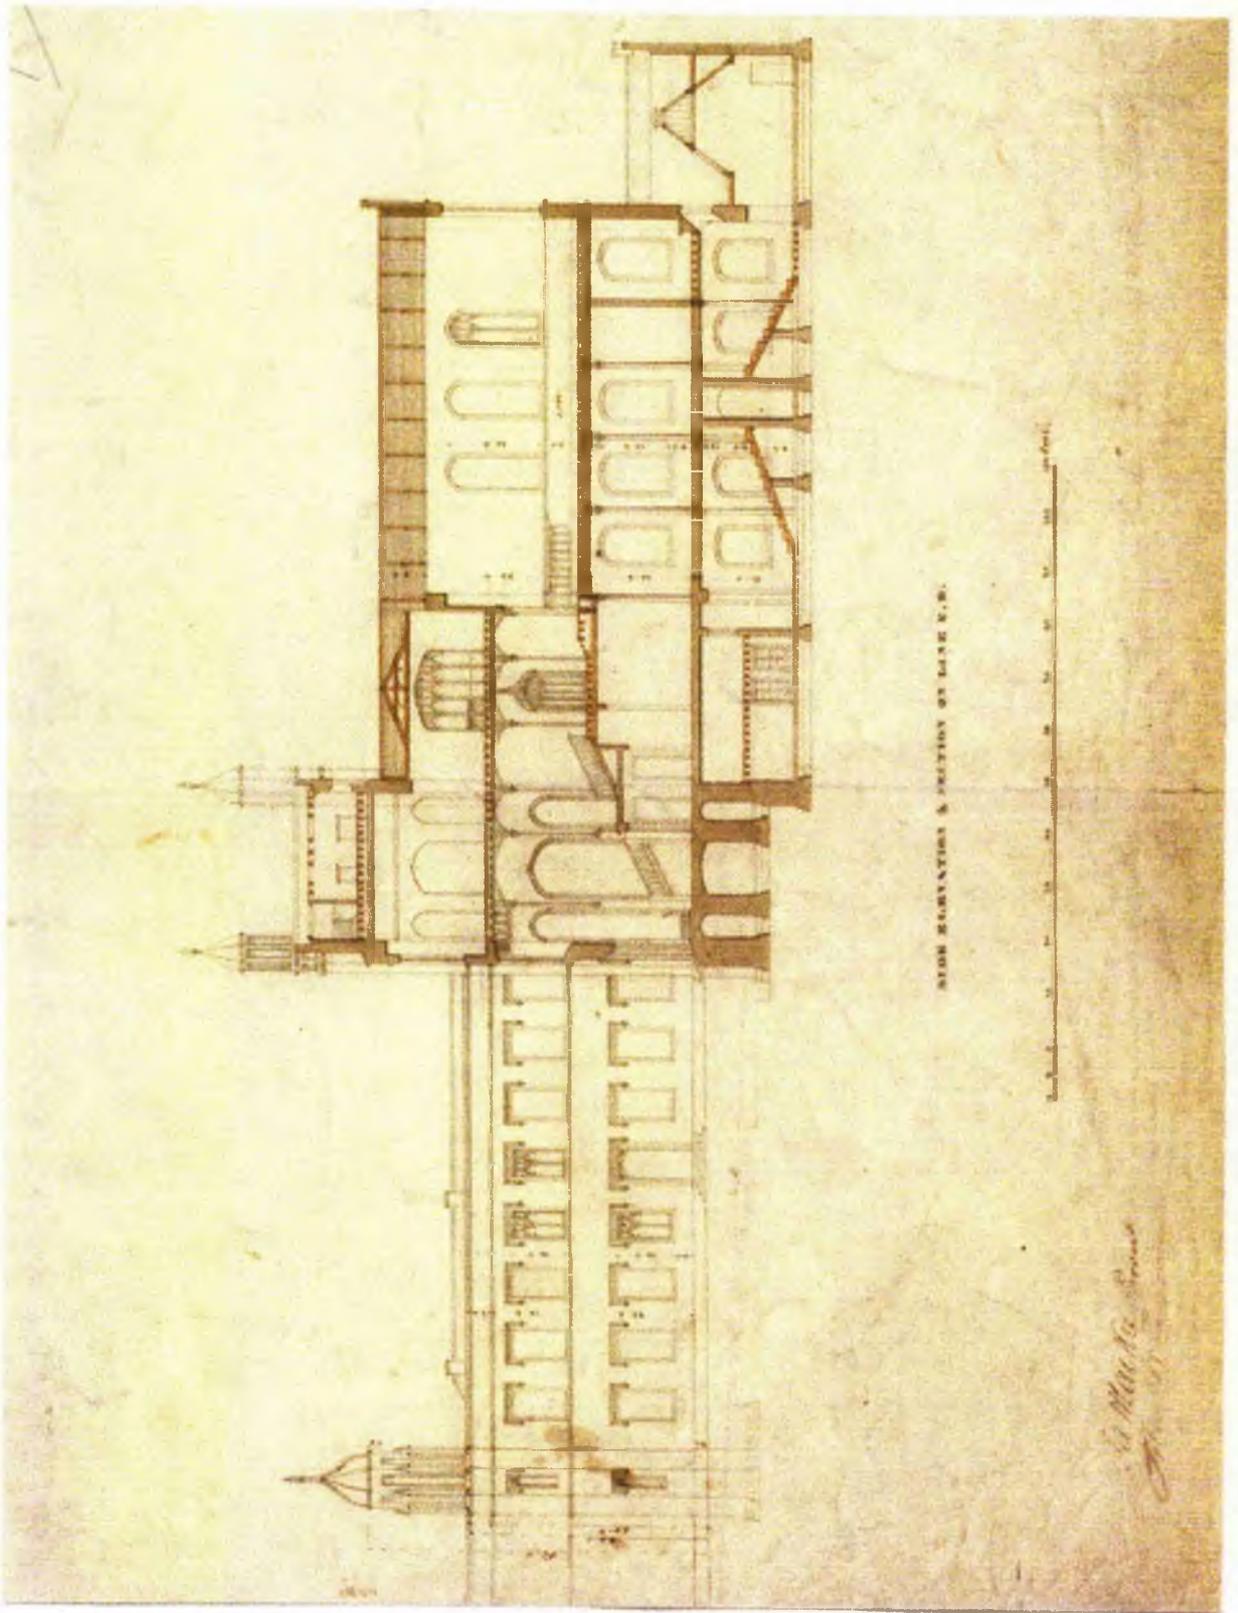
Marischal College. Side elevation and section C-D. A. Simpson, June, 1836.
